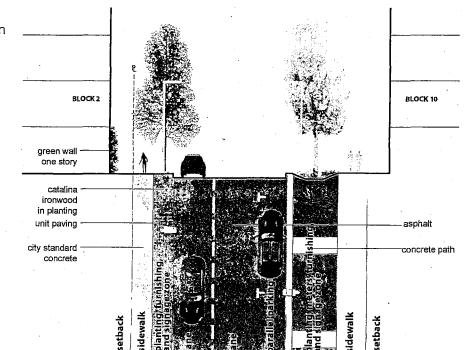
Street A, cross section between Block 2 and Block 10
